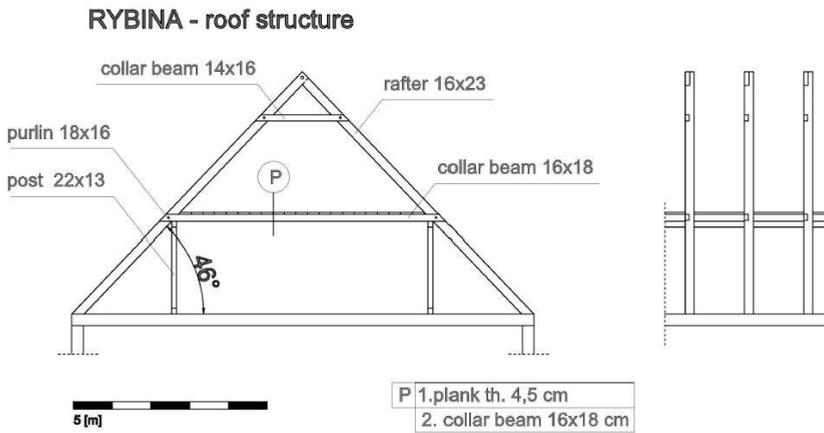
The simplified scheme of the roof structure of the arcaded house in Rybina. (author's study)
